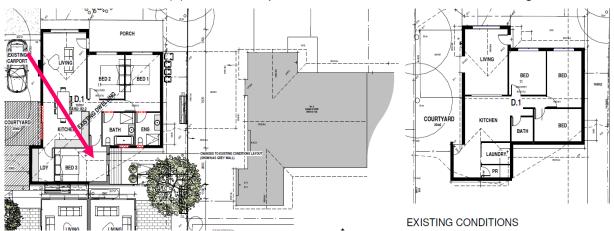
Existing ground floor layout for Dwelling 1 on the right and the proposed floor layout on the left
